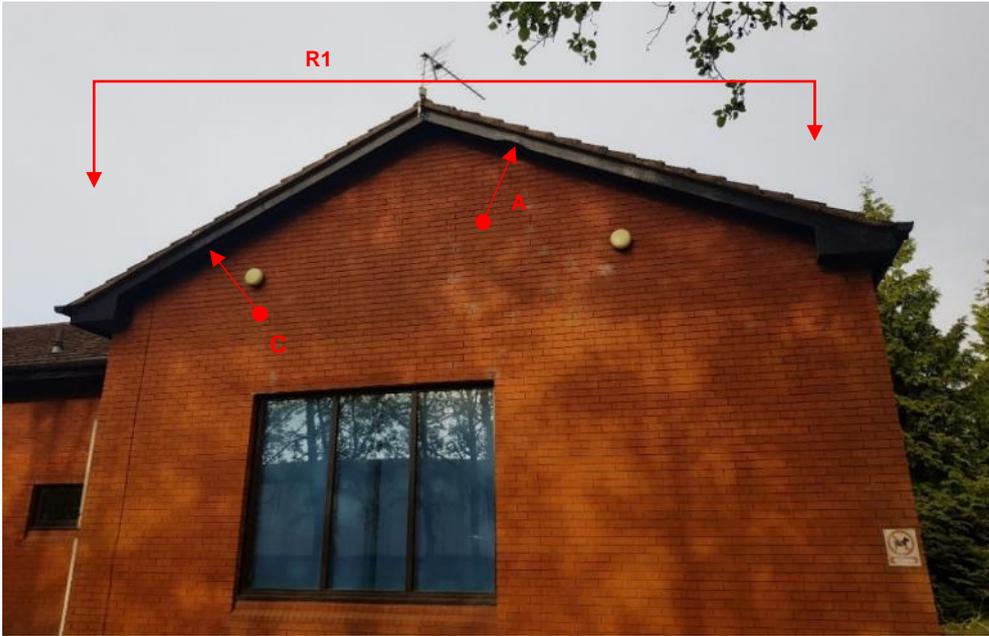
B15, Location of Roost 1 (Common Pipistrelle), at the eaves of B15 (West elevation).
